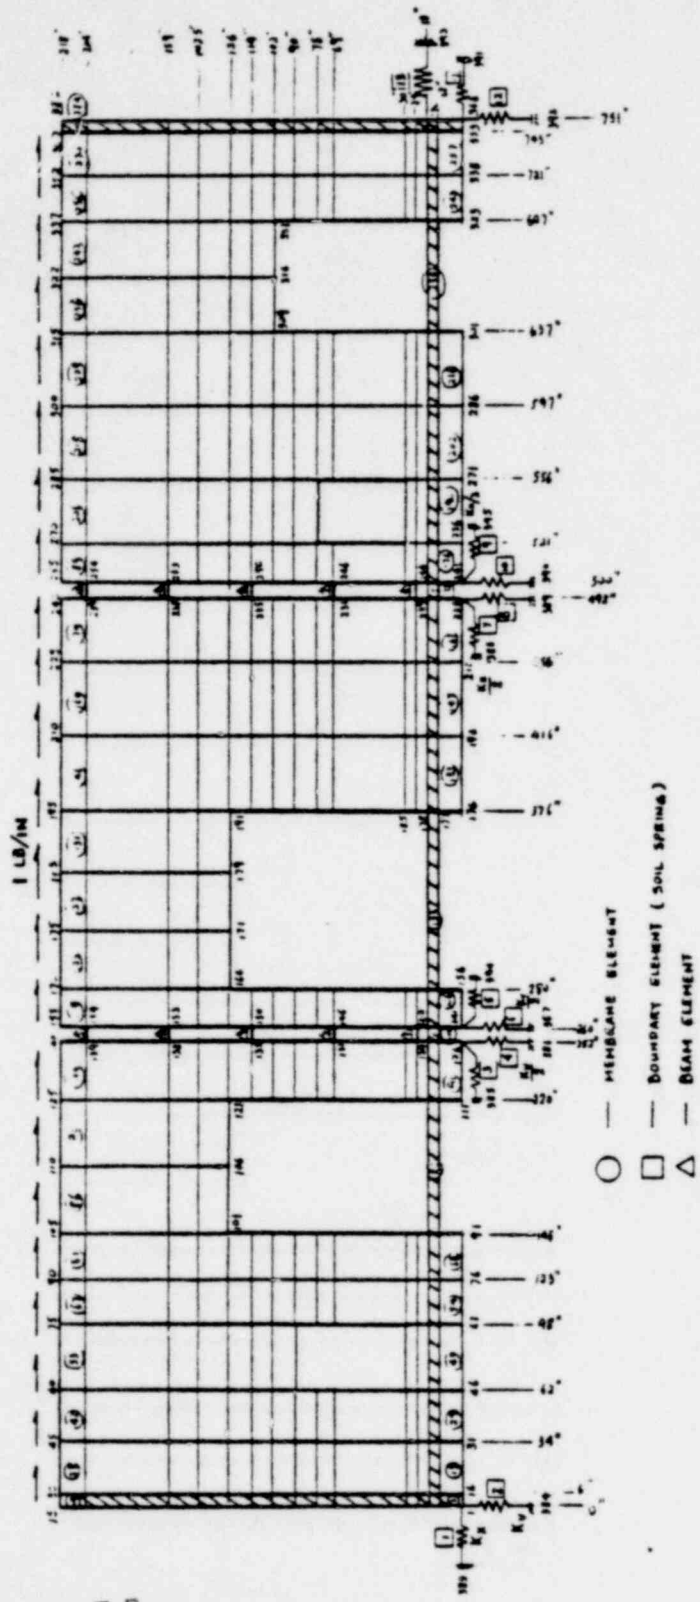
FINITE ELEMENT MODEL OF SOUTH WALL
